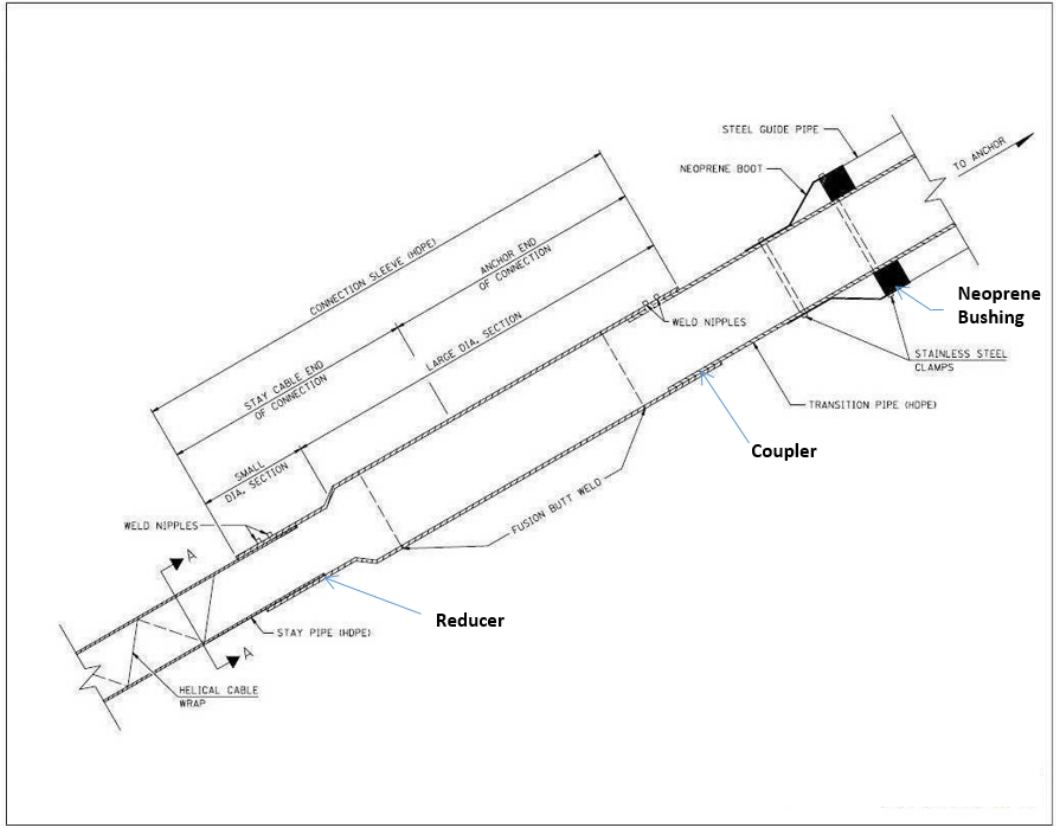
Tower Anchorage and HDPE Piping Terminology.
